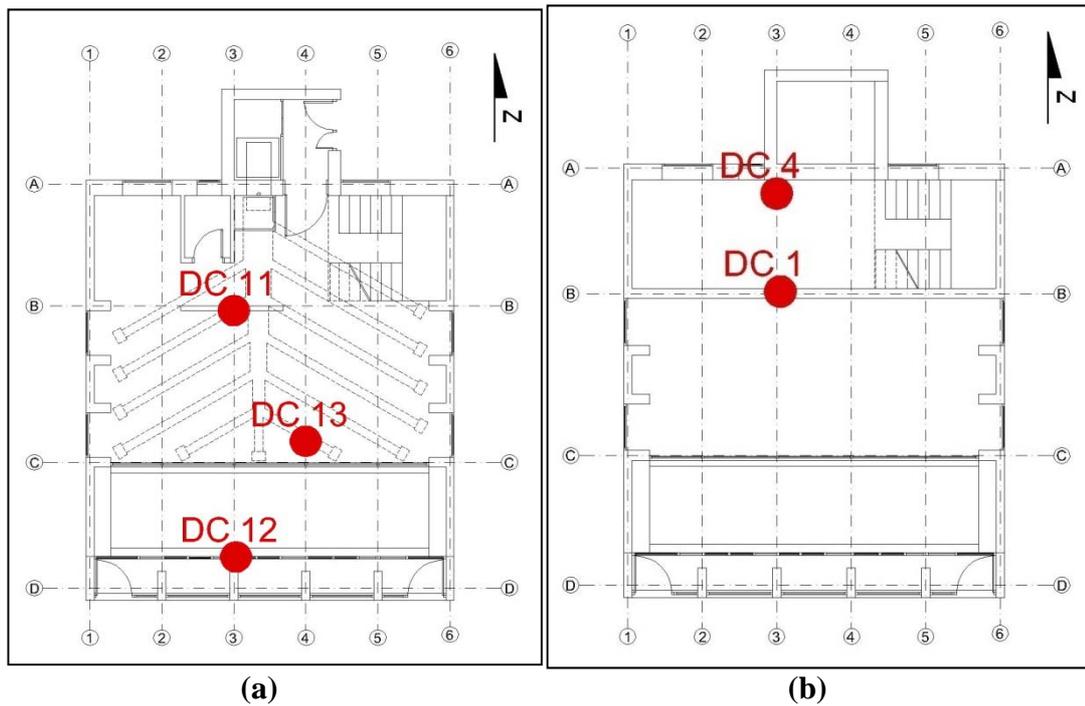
Locations of data loggers shown on floor plans of the Solar Building
